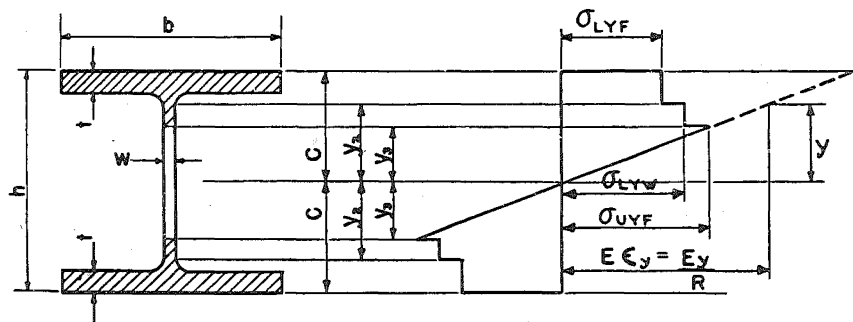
ASSUMED STRESS DISTRIBUTION IN STEEL BEAM STRAINED BEYOND ELASTIC RANGE.
